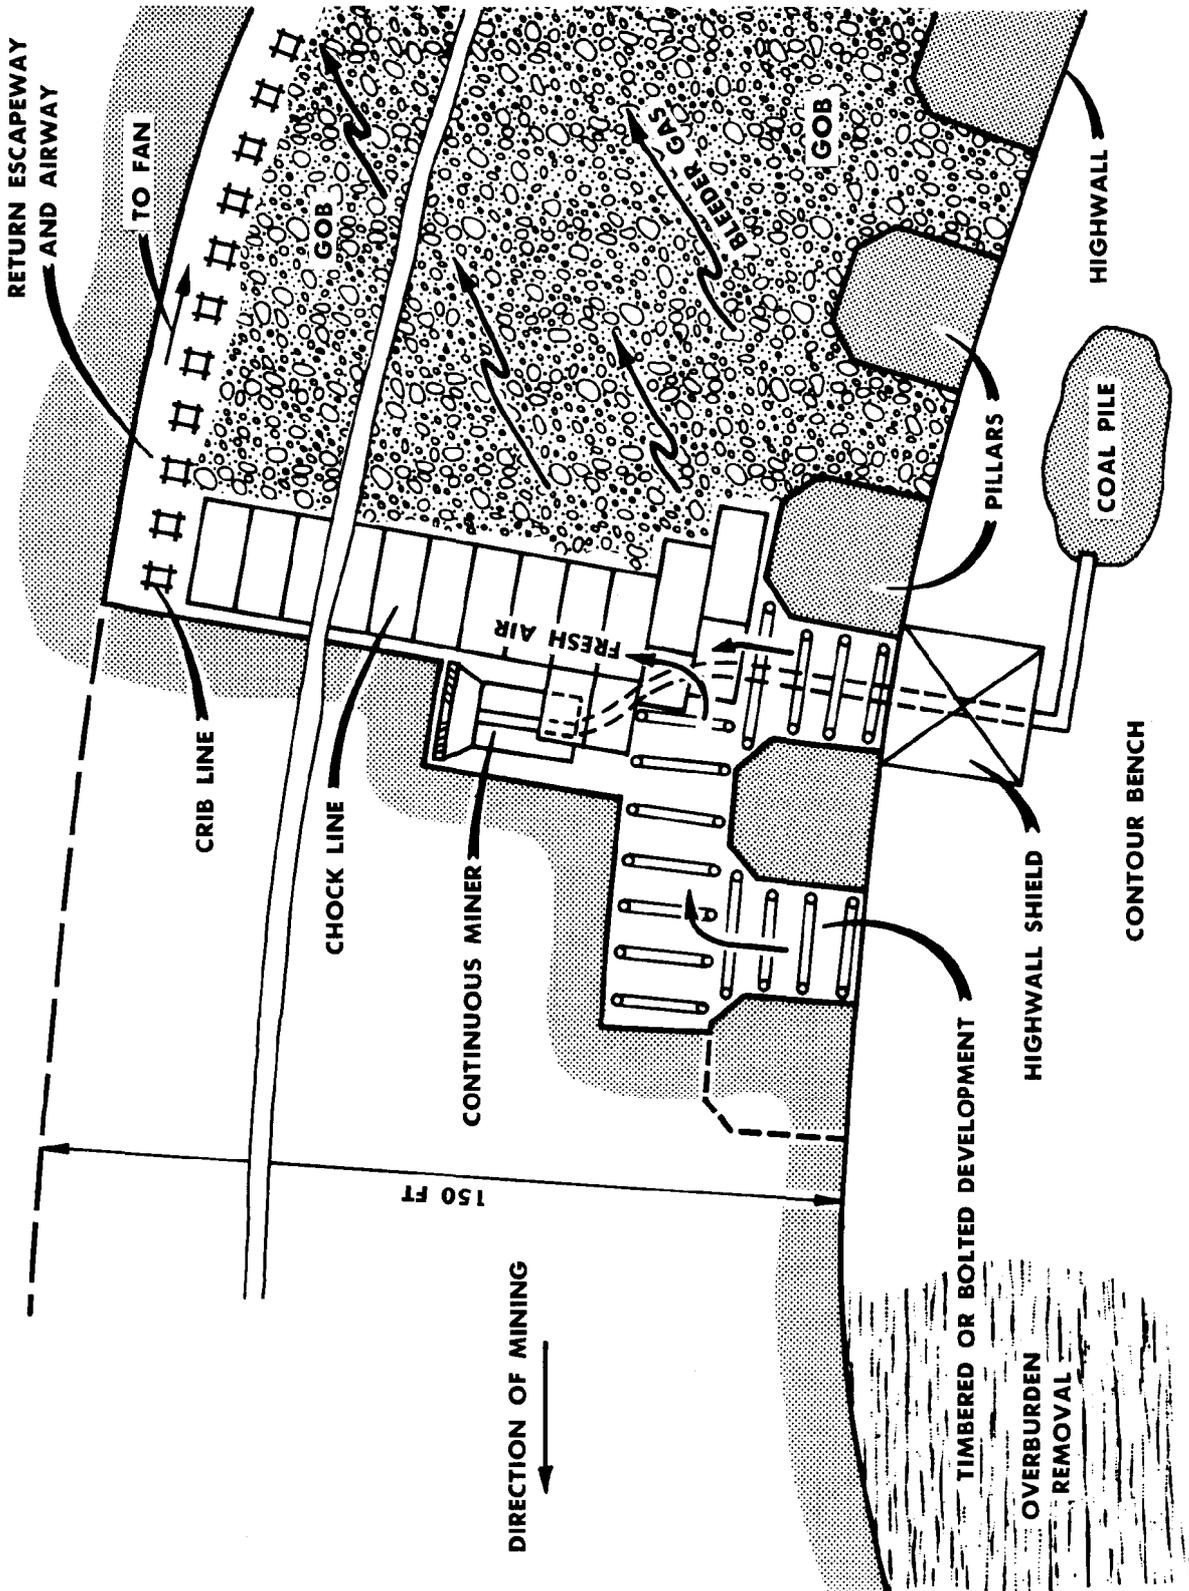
Plan view of surface shortwall operation with highwall buttress pillars.
